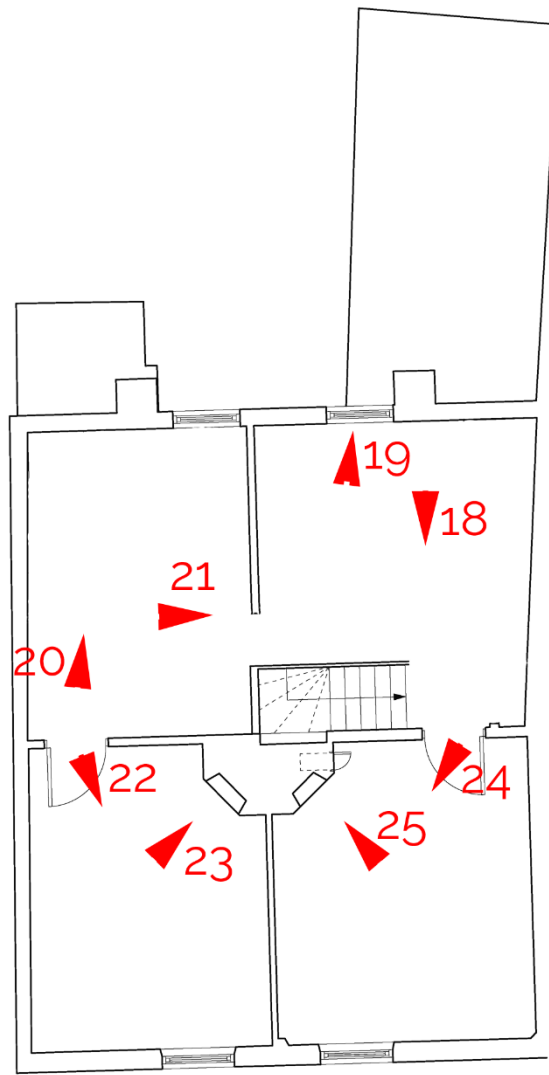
The first-floor plan of the property at 1:100, showing locations of photographs included in the text. (Plan after Beech Architects, with amendments.)
